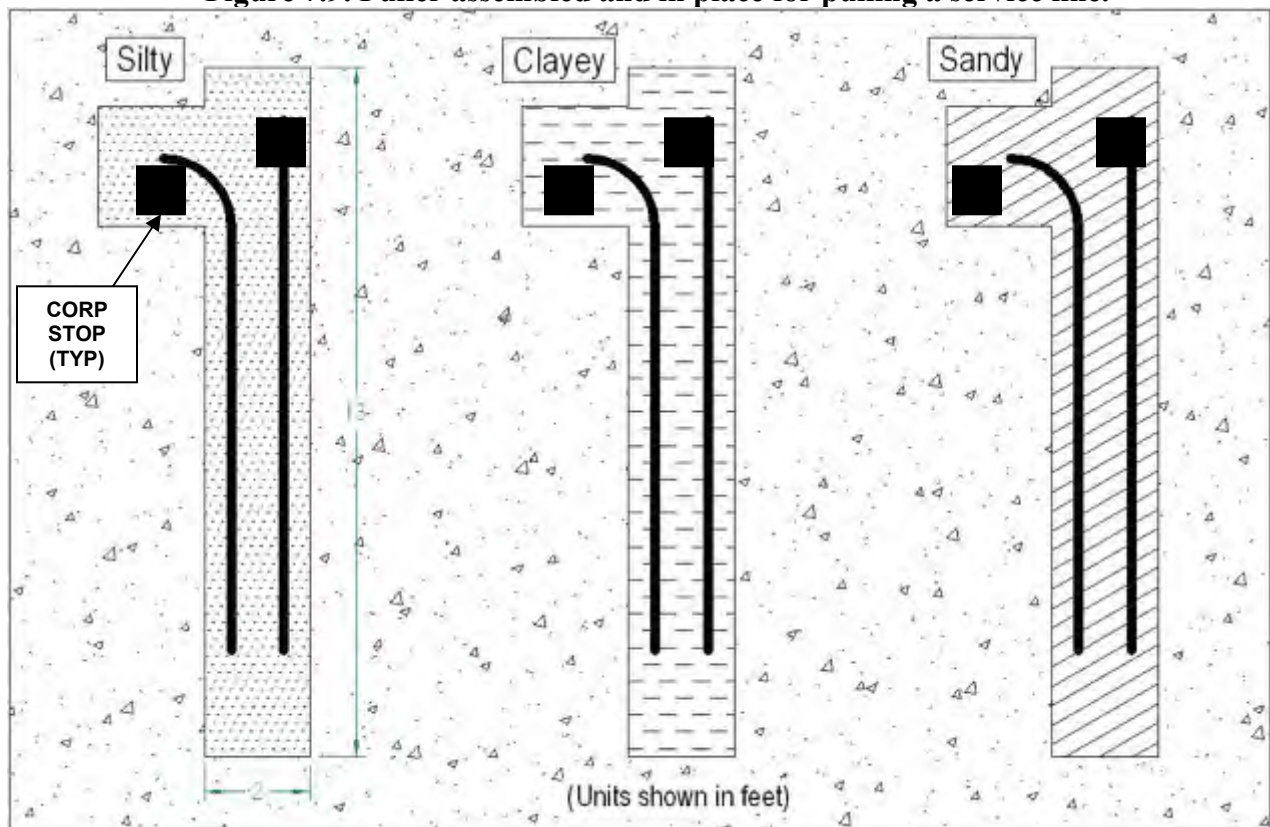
Schematic of straight and bent pipe trench layouts.
